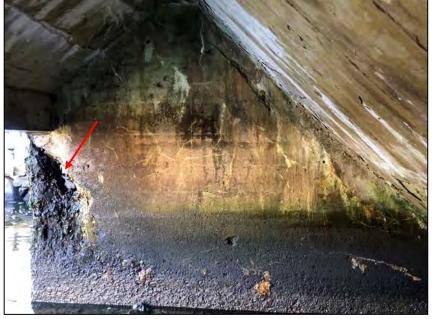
Right Wall. Note the section loss on the downstream end.
